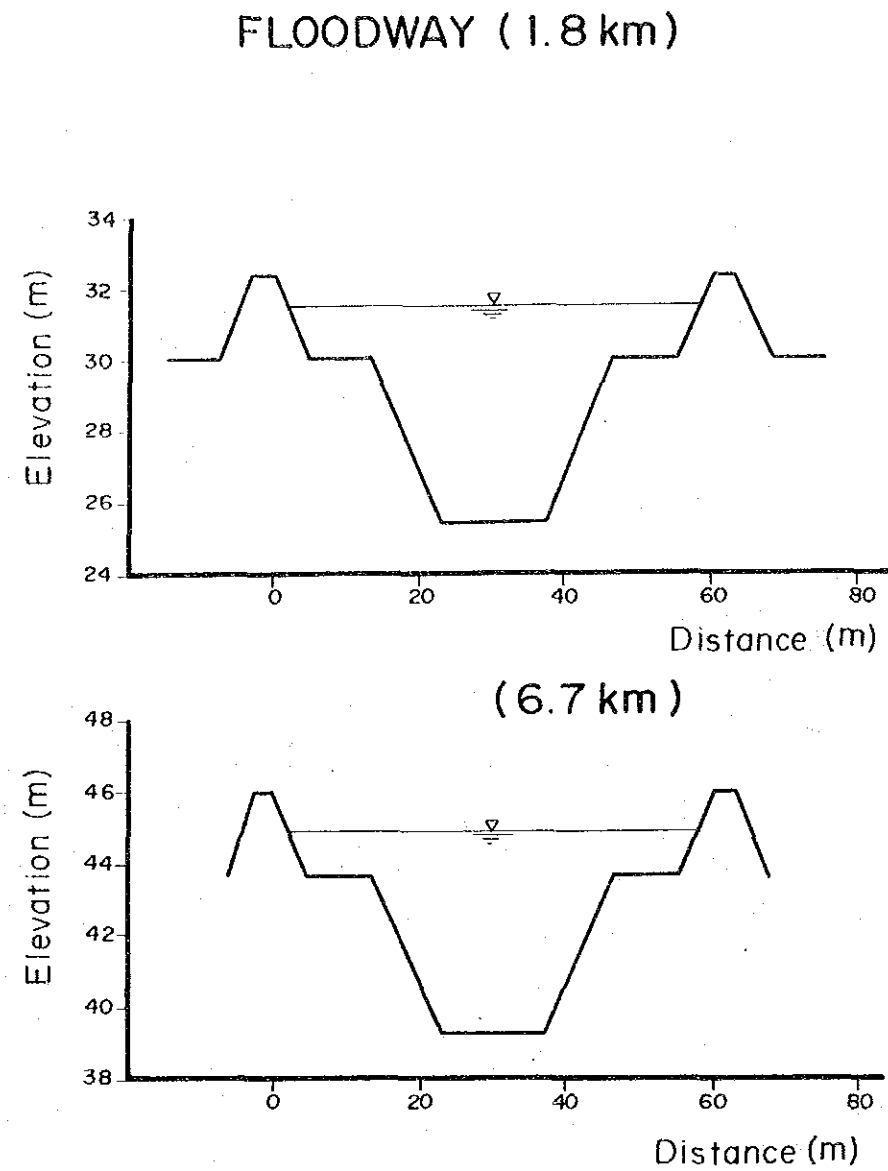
TYPICAL CROSS-SECTION OF BINALONAN FLOODWAY
